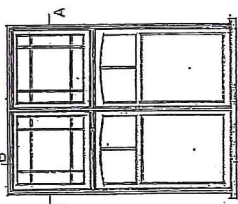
DETAILS OF TRADITIONAL TIMBER CASEMENT WINDOWS
